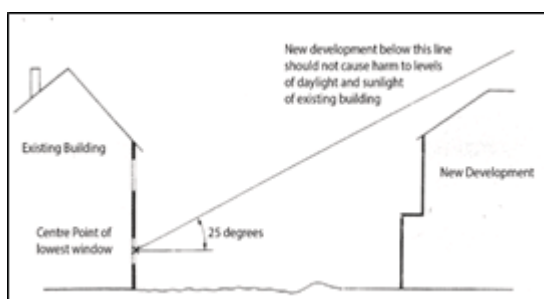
Section in plane perpendicular to the affected window wall from existing to proposed development showing acceptable application.
